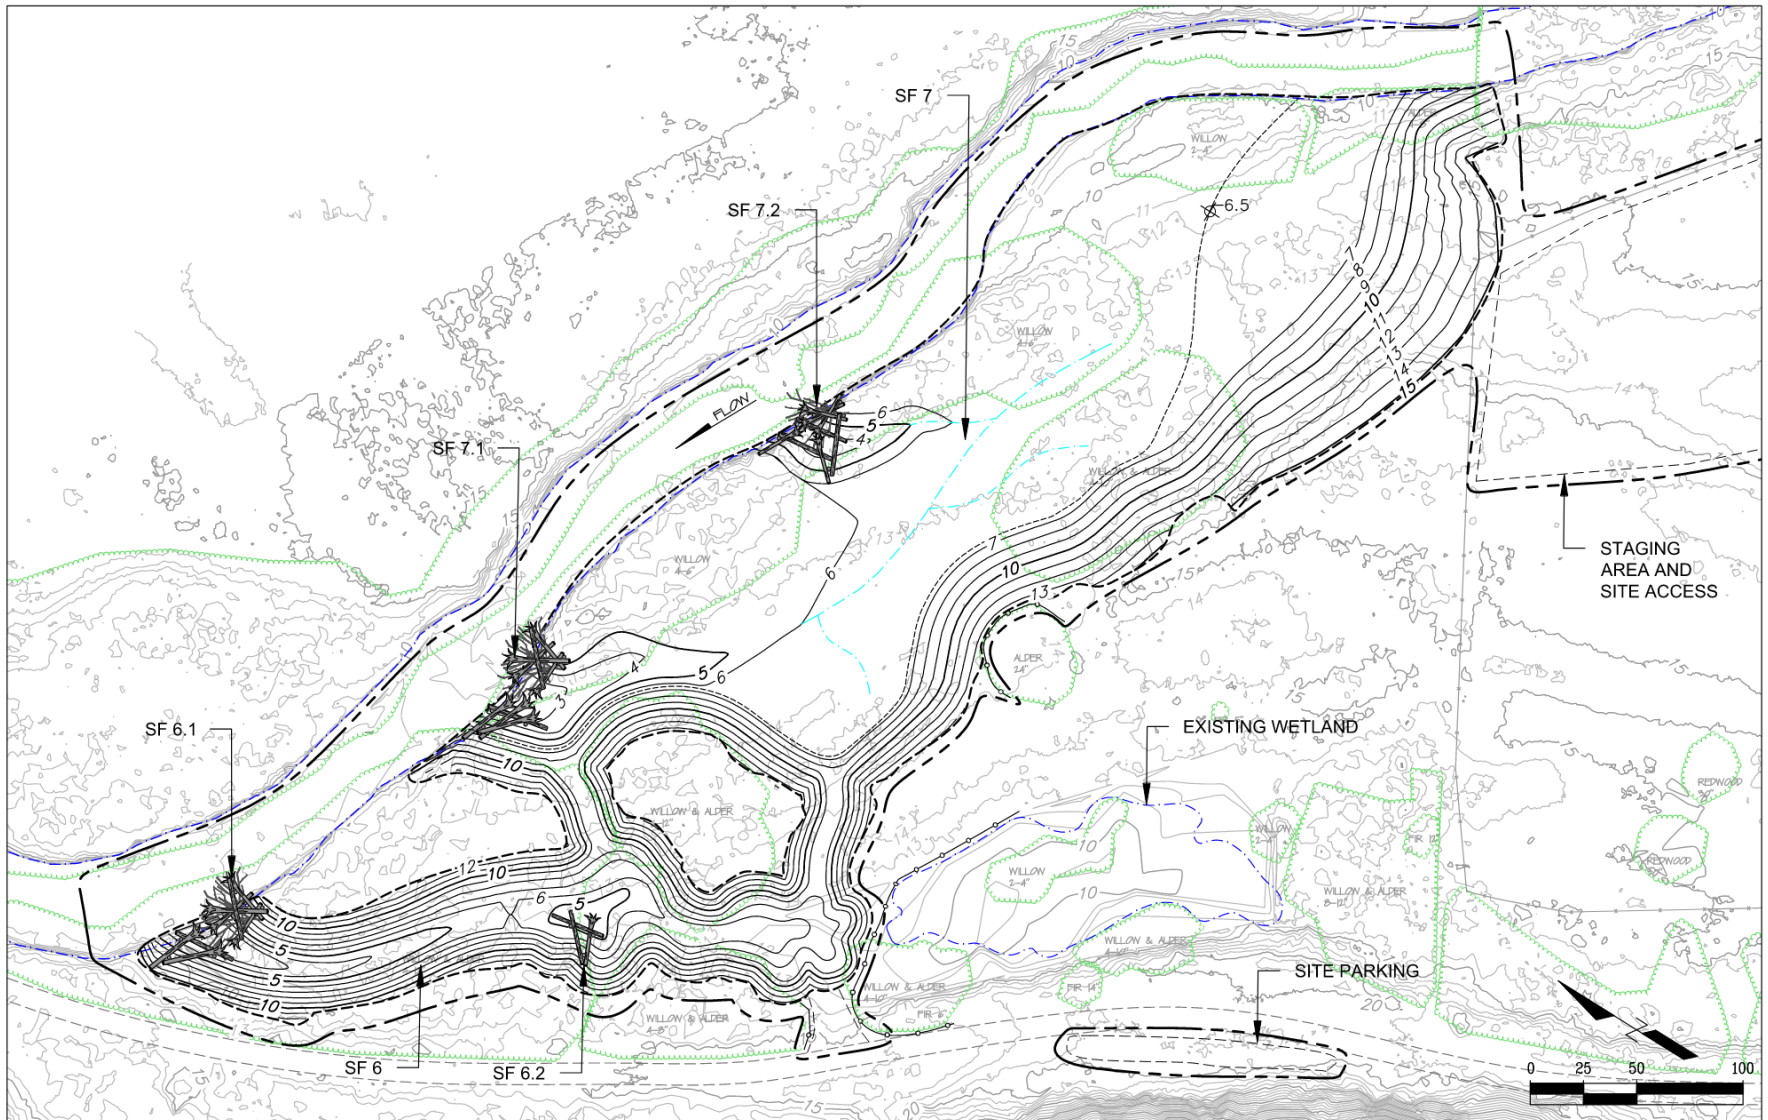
Site plan for SF 6 and SF 7 showing grading, large wood structures, and site access.
